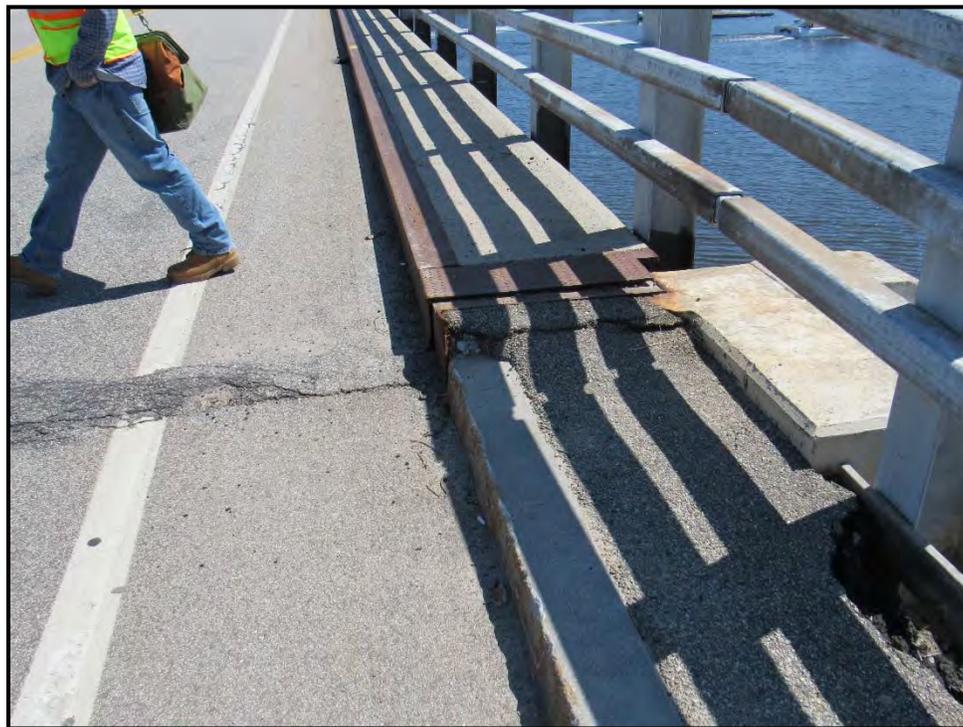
Bridge #241/053 – Bridge rail and sidewalk transition at West Abutment. (Bridge #031/142 similar).
